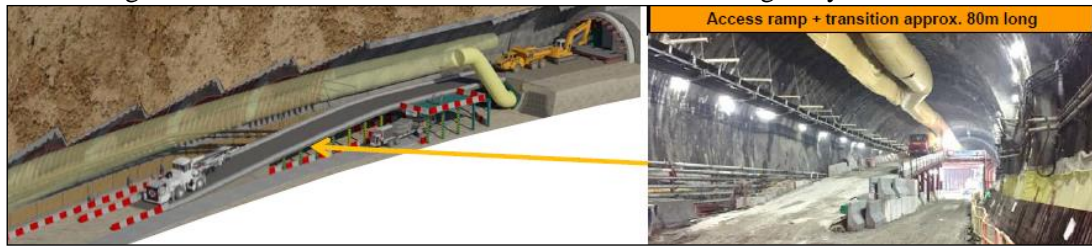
Special gallery section at the start with access ramp and side span vehicle entrance into the gallery
